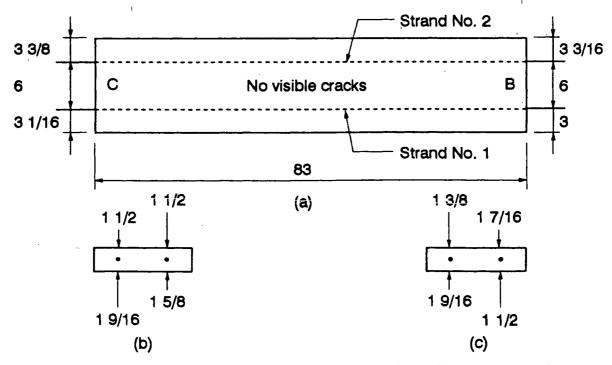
Specimen No. 2-3.0TC-4 (dimensions shown in inches):
